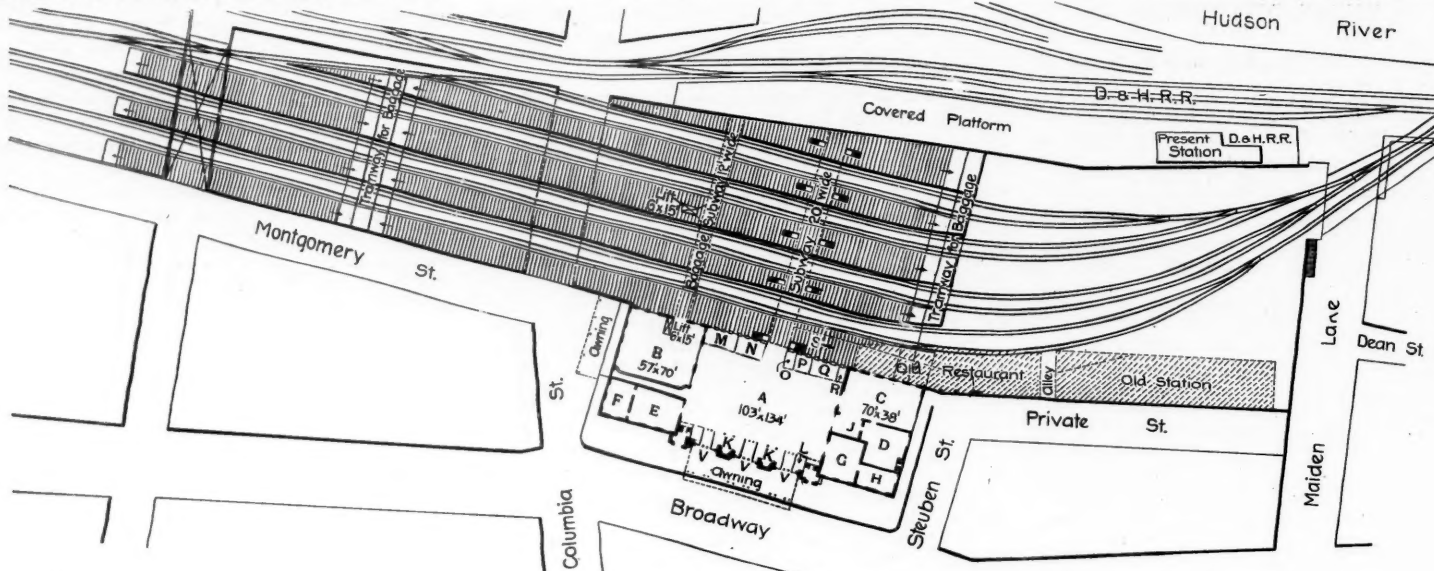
Plan of New Union Passenger Station and Relocated Tracks, at Albany, N. Y.
